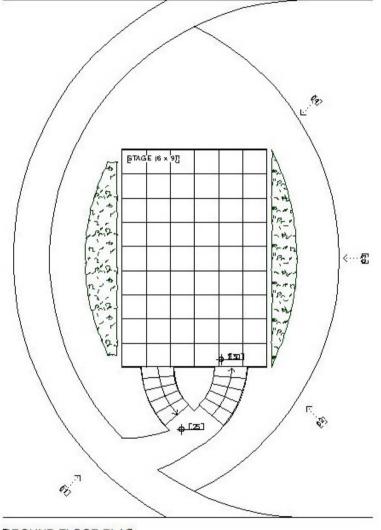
| Village Park Outdoor Performance Space – Concept Plan
